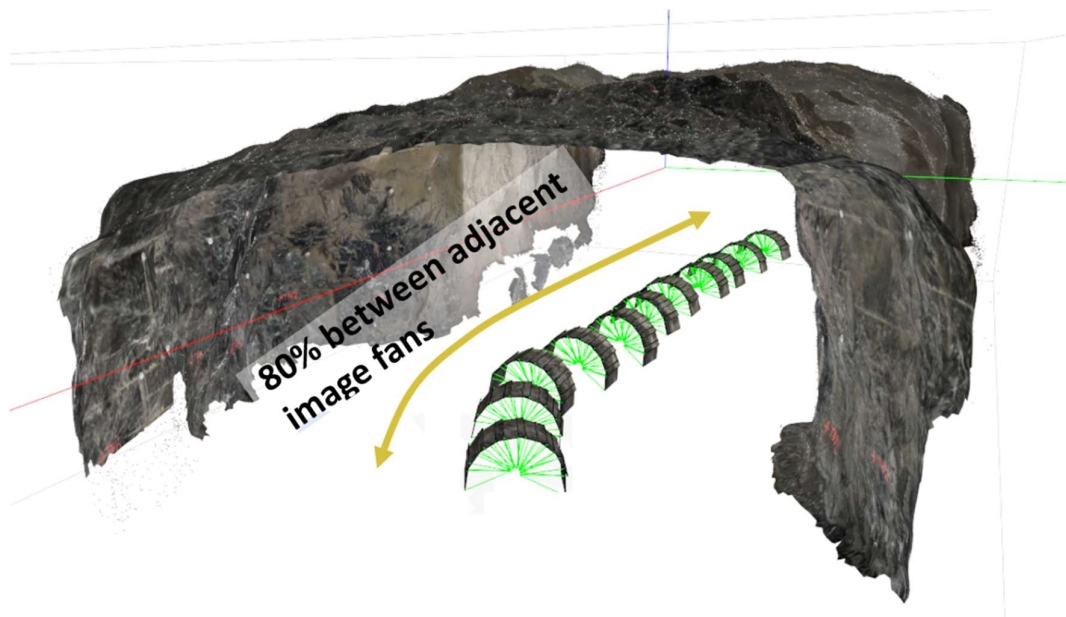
Exemplary setup for imaging the tunnel perimeter without the tunnel face
